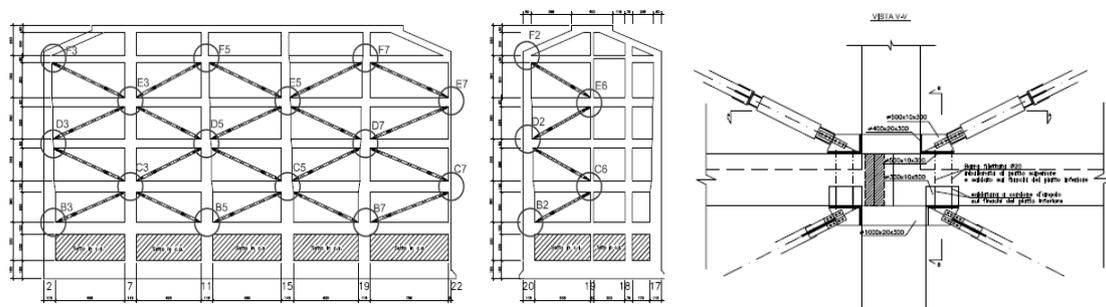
Existing structure: BRB distribution inside the frame (a), detail of BRB connection (b).
